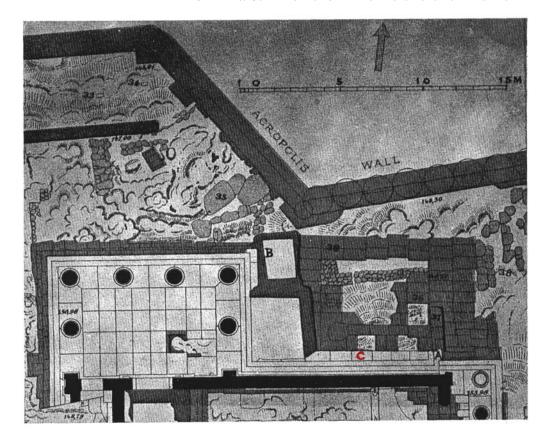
Plan of the north porch and the boundary wall (after, Stevens, 1946).
